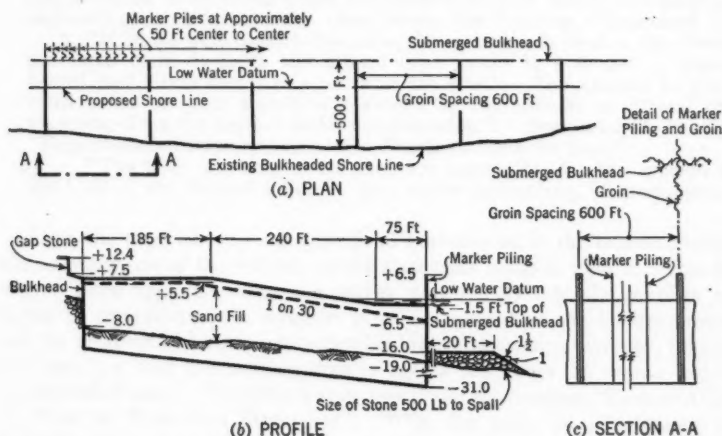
SUBMERGED OFFSHORE STEEL BULKHEAD AND STEEL GROINS FOR ARTIFICIAL FILL SECTION
